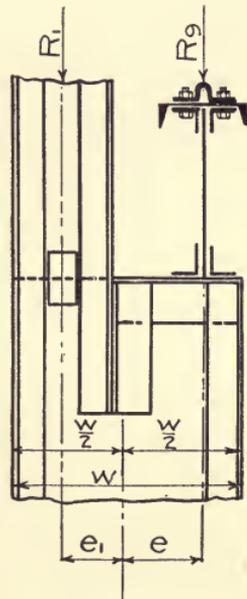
Runway-Girder and Roof-Truss Eccentricity.
